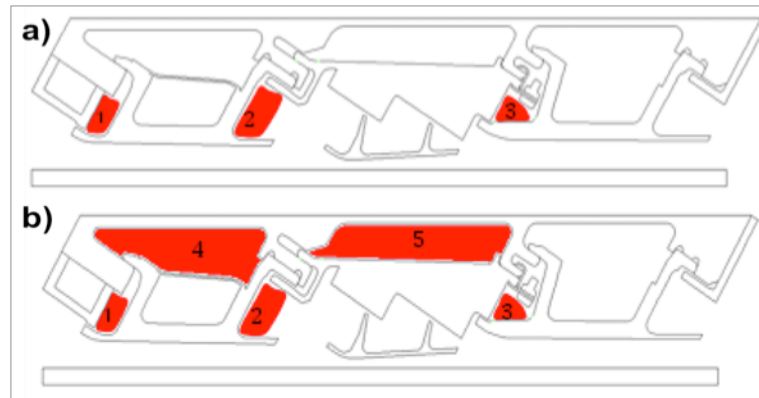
Configurations a) 3 blankets, b) 5 blankets
